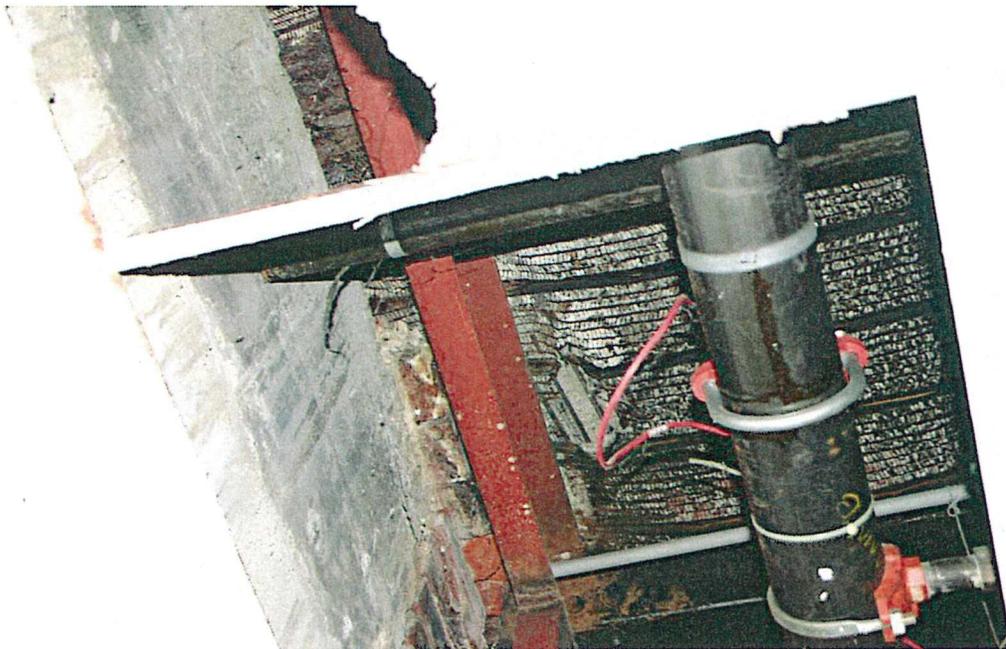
Partial view of newer structural steel added to the west side of the first floor structure.
